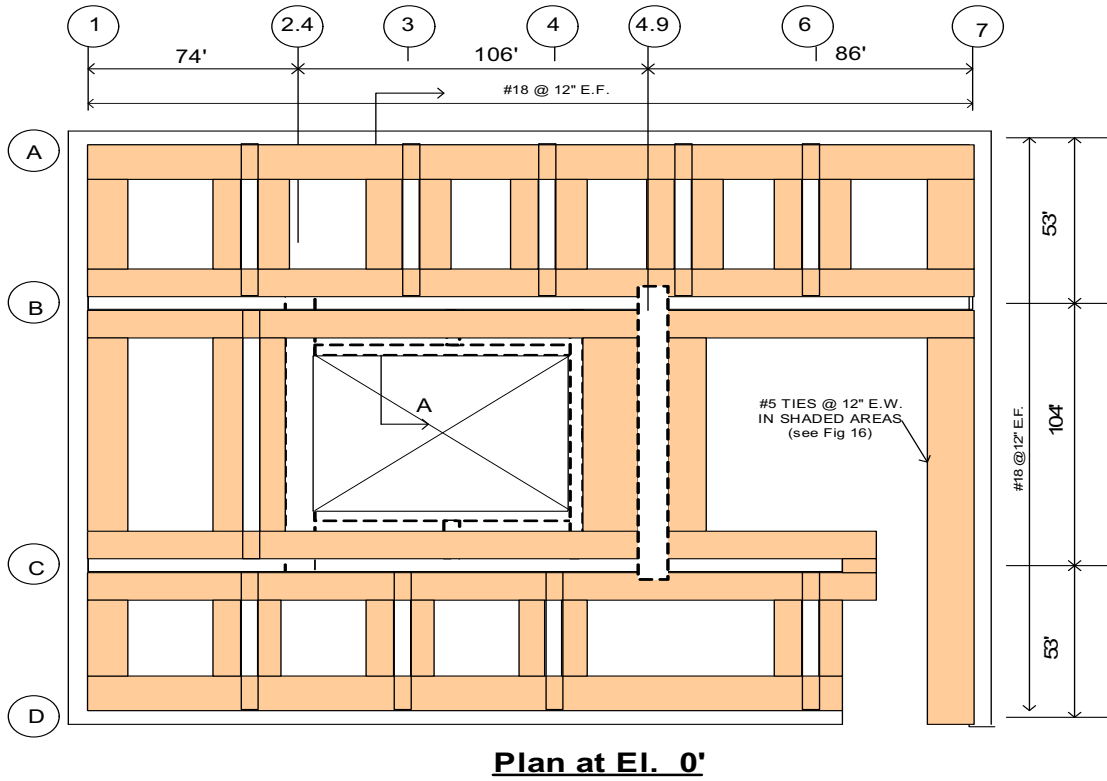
Grade Basemat Reinforcement (6' thick concrete)
